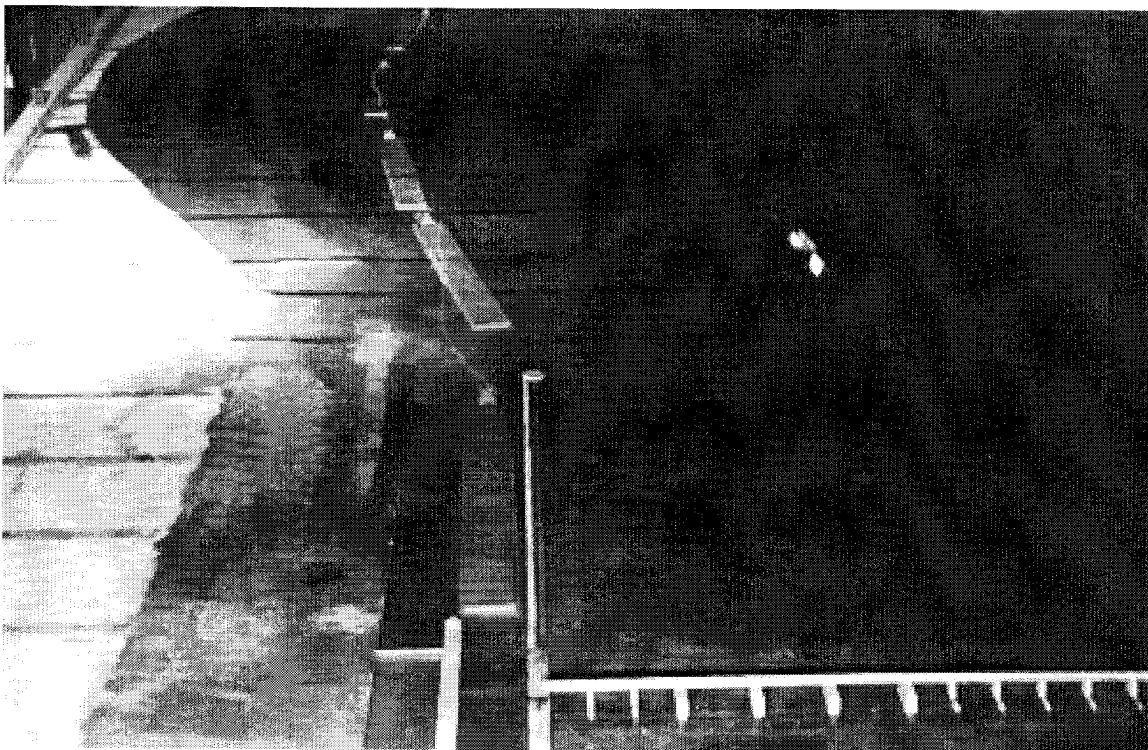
Lock Location 3. Plan A. looking upstream, discharge 276,000 cfs, showing path of downbound tow approaching 1,200-ft lock
